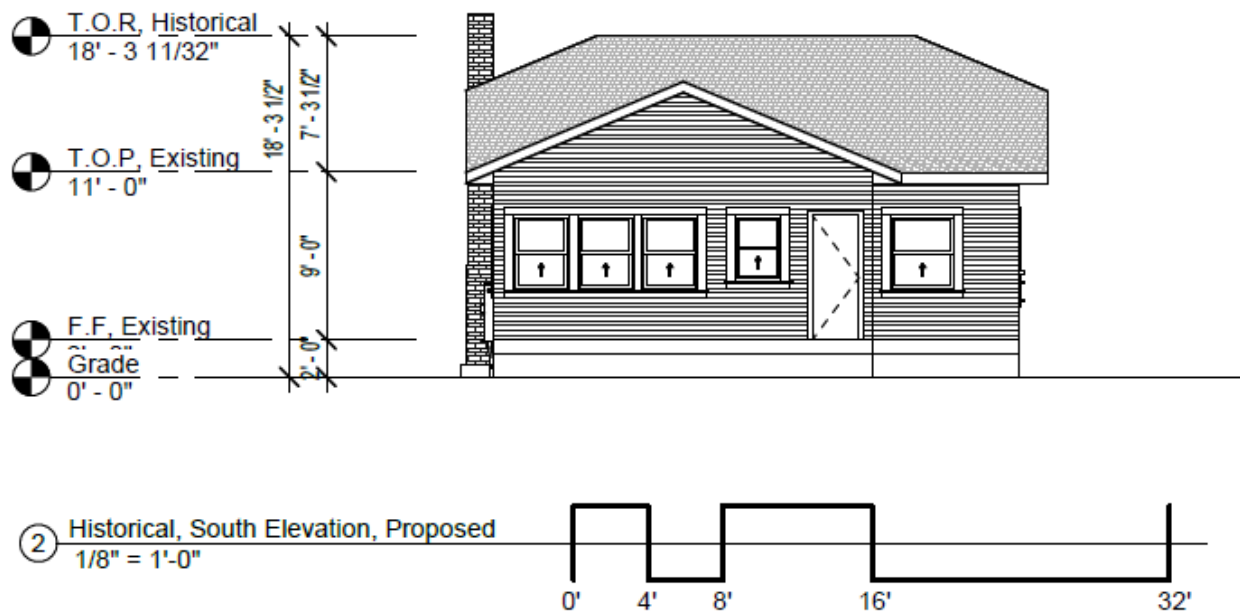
Proposed south elevation of the historic residence, showing window replacements. Source: GKW Architects, 434 Crescent Avenue Residential Development, A201. September 2025.
